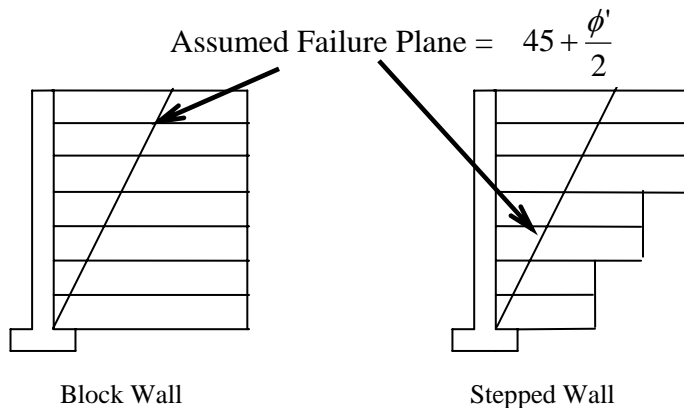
Failure Plane for MSE Wall Reinforcement Length Determination
